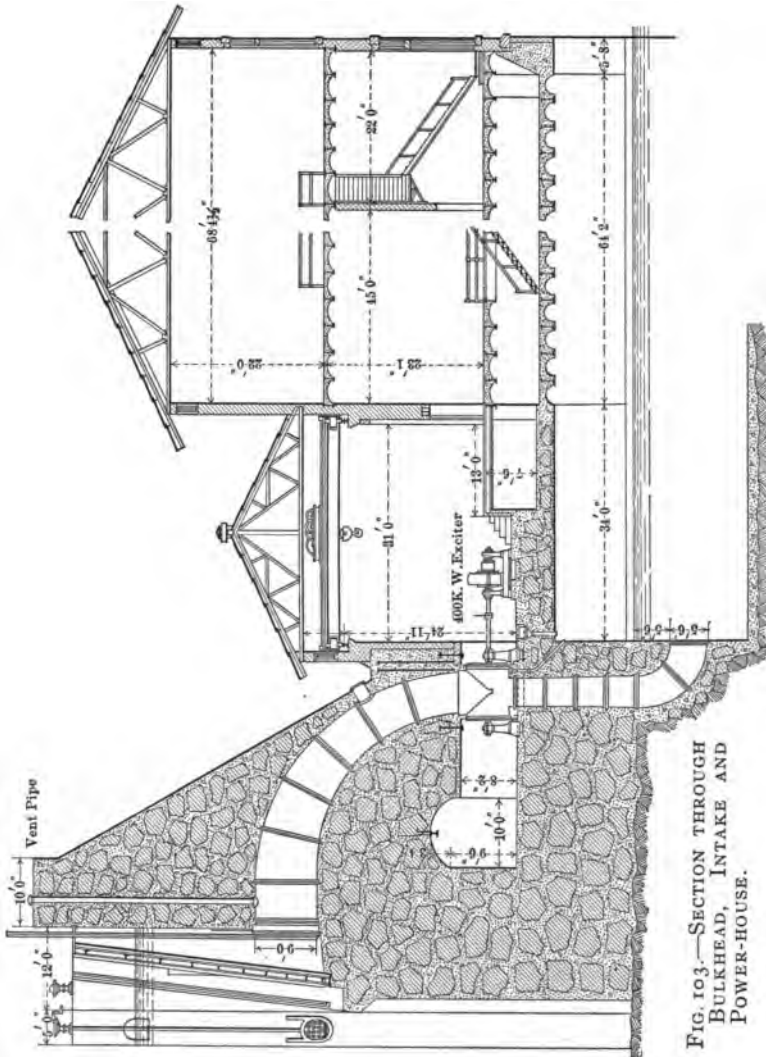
SECTION THROUGH BULKHEAD, INTAKE AND POWER-HOUSE.
